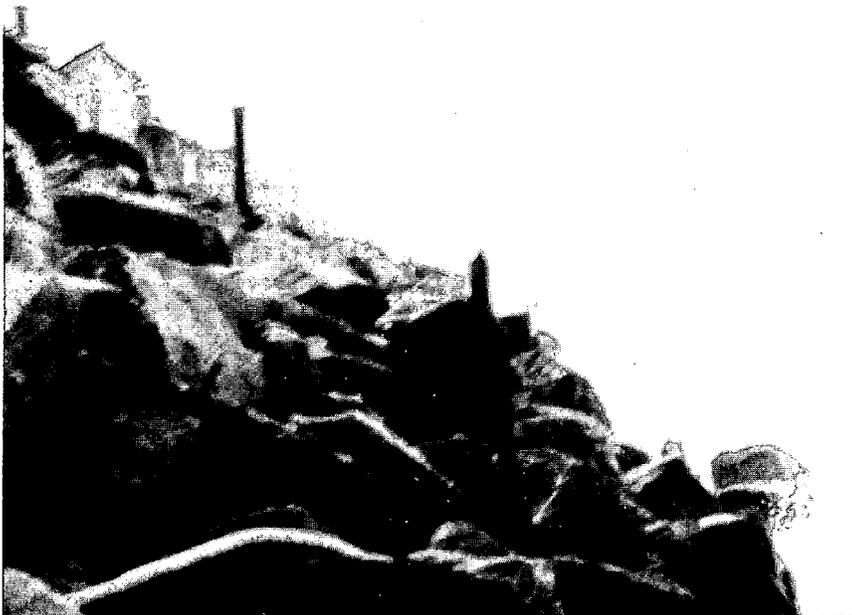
Heavy revetment protecting upland structures in Rio Del Mar Beach.
